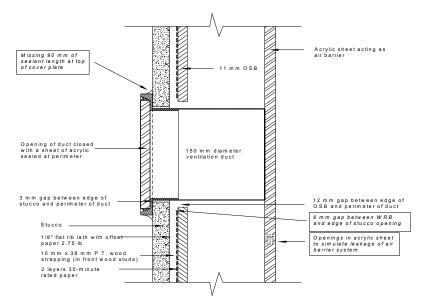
Wall/duct detail for specimen No. 5- Vertical section
